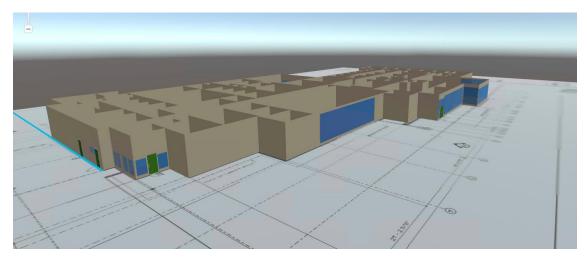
Architectural Floor Plan used in to Trace in the Energy Model
